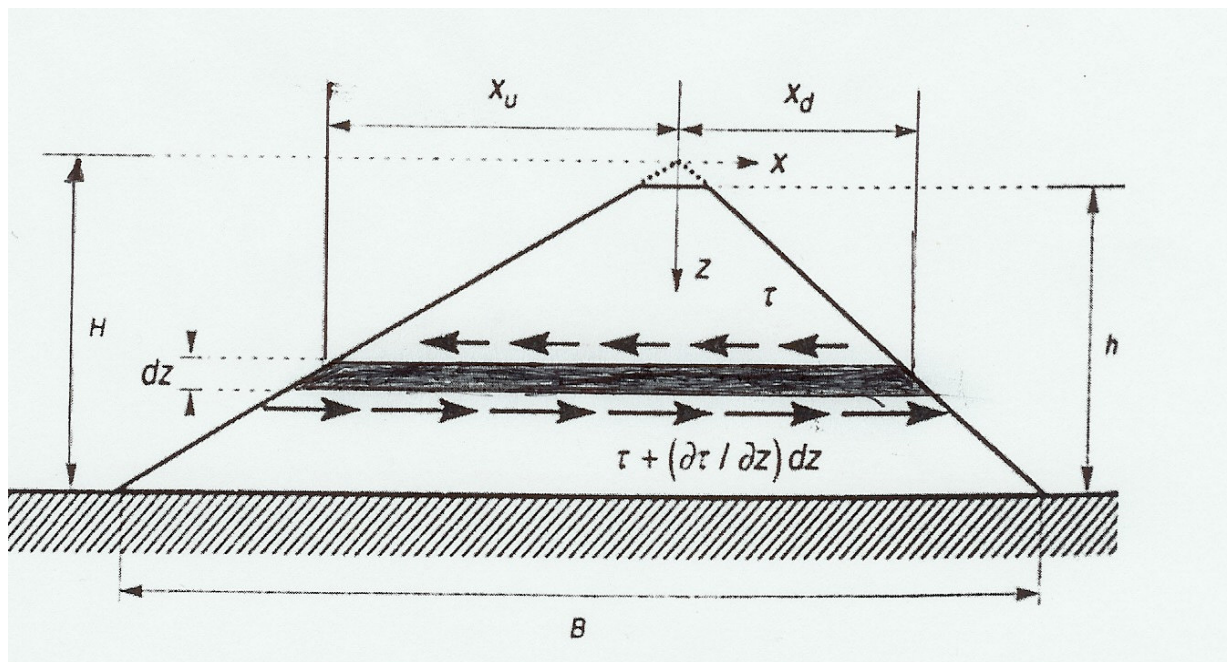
Earth dam showing stresses acting on an element of thickness dz (Kramer, 1996)
